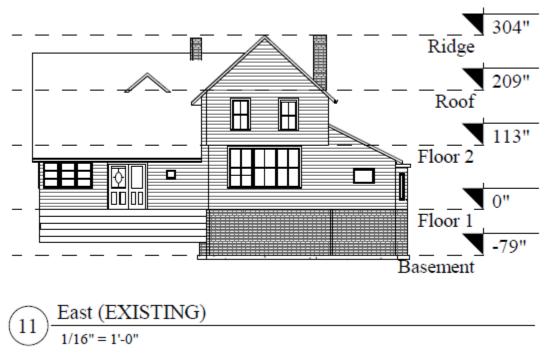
Existing Structure, east elevation, 869 Sangster Avenue. (Image from owners.)
